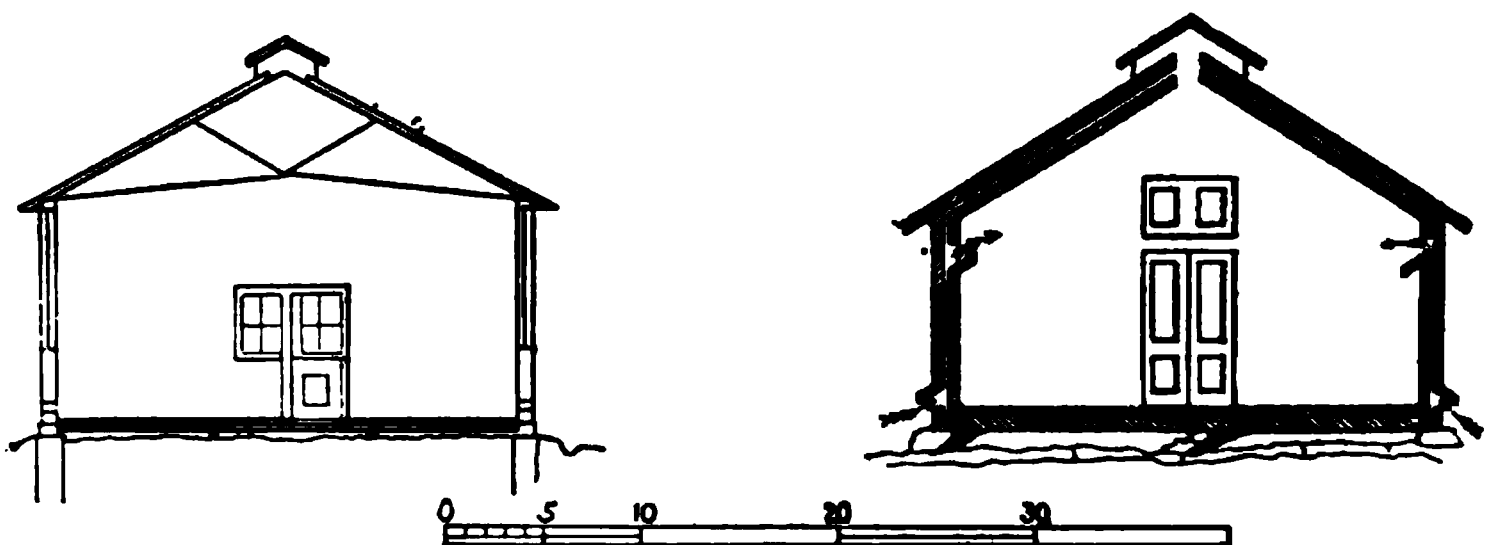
VERTICAL SECTIONS THROUGH SAME HOSPITAL.
